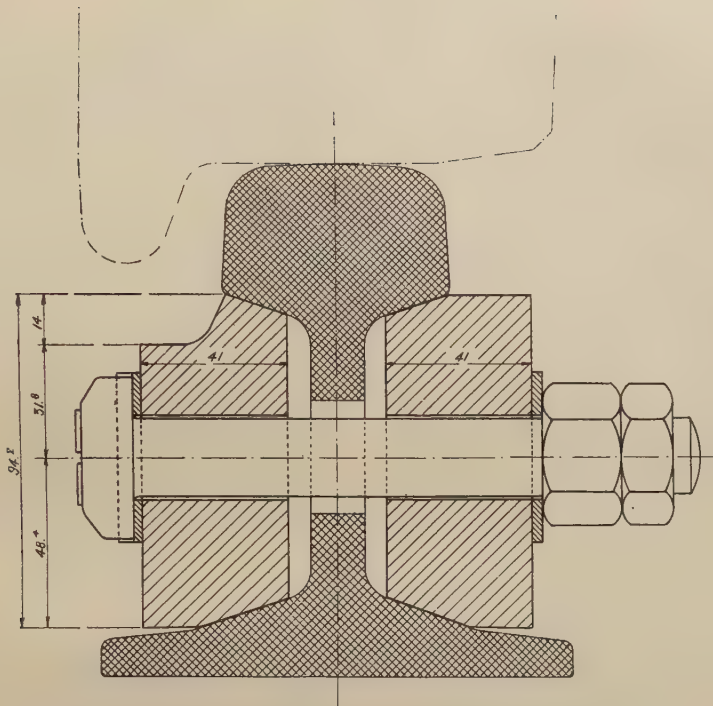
Main French Railways. — Fishplates in bakelised wood for joints electrically insulated.
